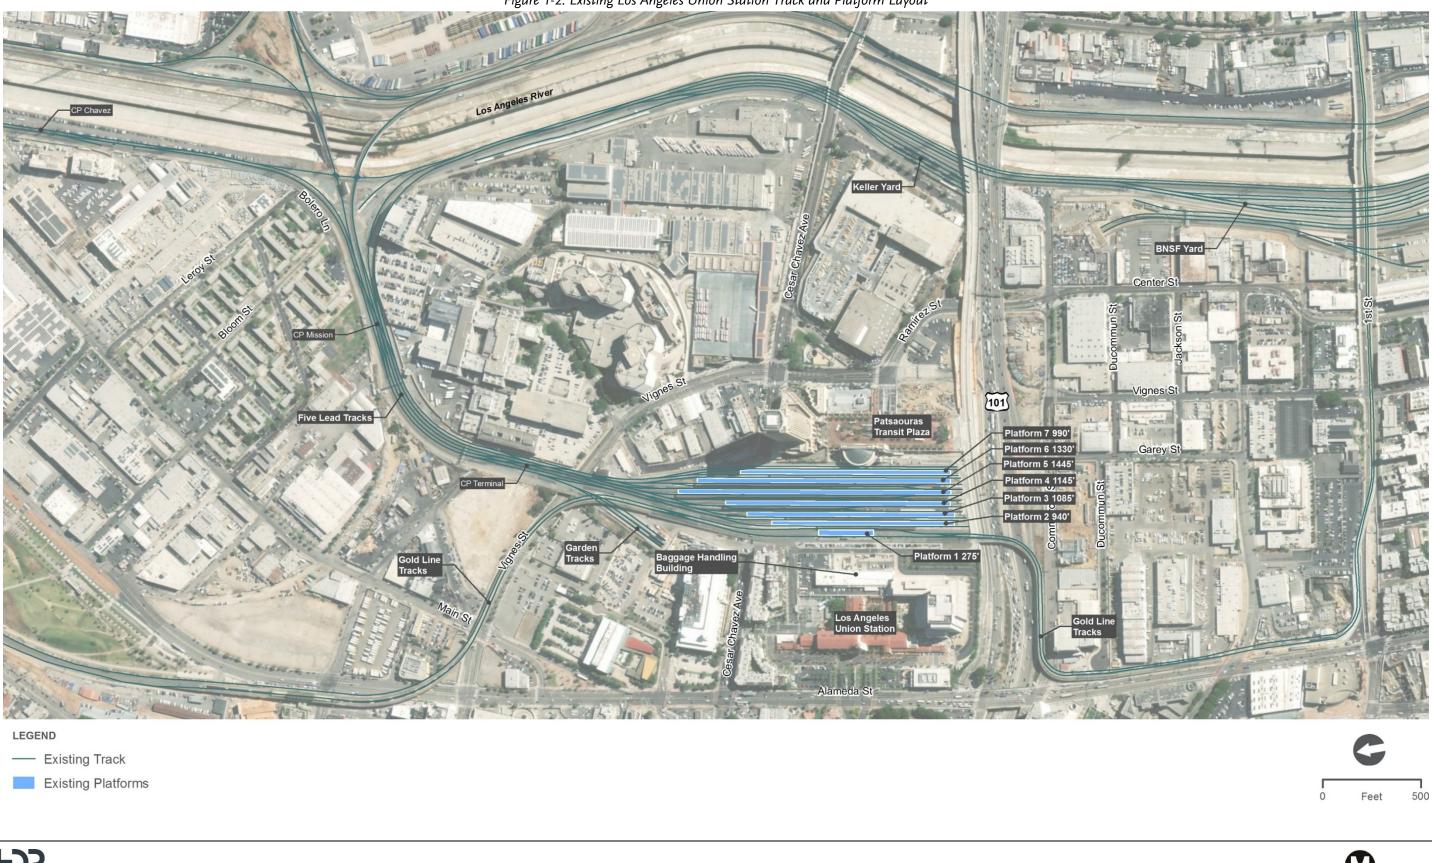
Existing Los Angeles Union Station Track and Platform Layout
